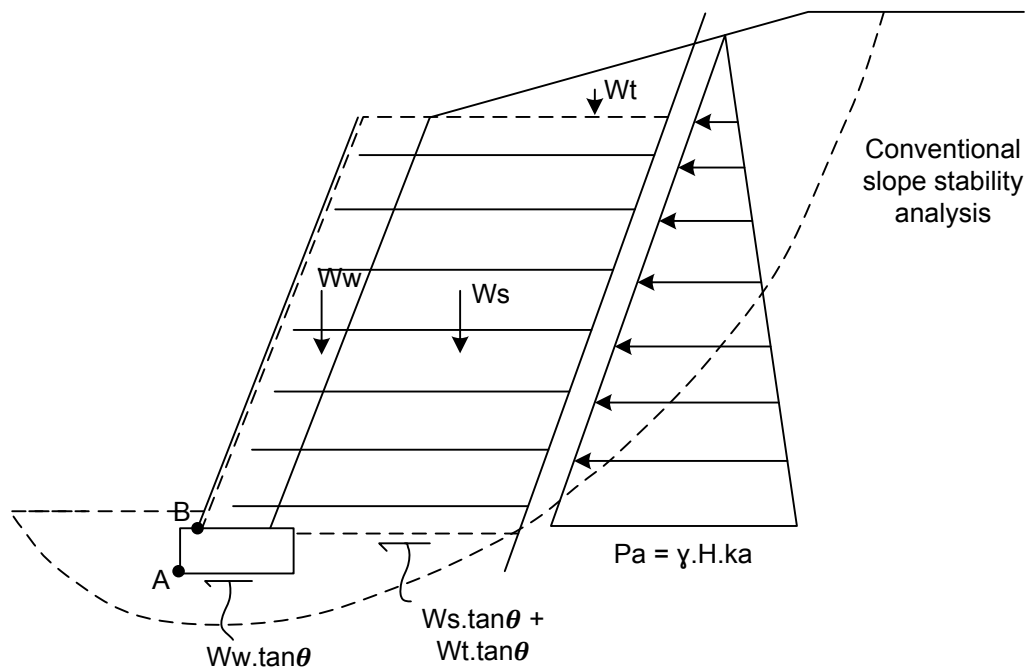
Overall stability of a reinforced CRB wall, figure adapted from CMA design manual for reinforced CRB walls (Gassner, 2005)
